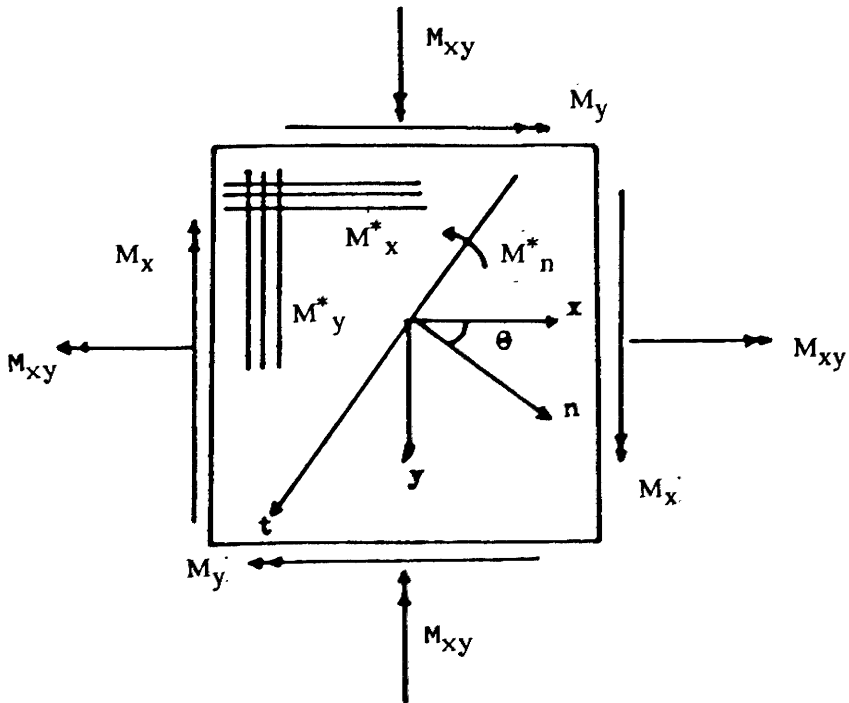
A typical slab element with orthogonal reinforcement.
